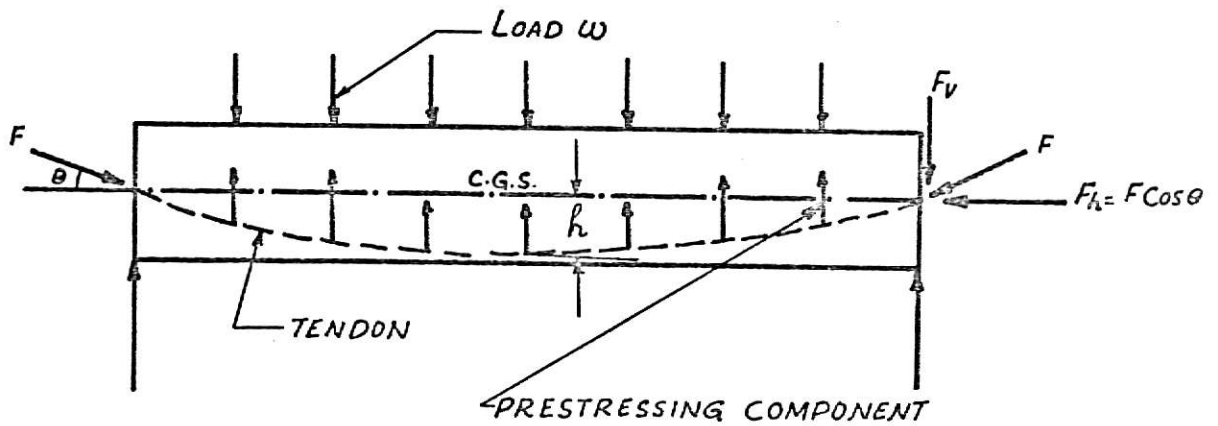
LOAD BALANCING DESIGN OF PRESTRESSED CONCRETE.
